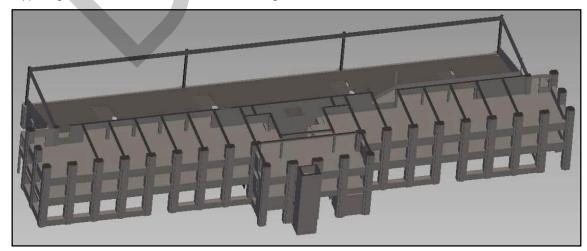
Cutaway showing beams, walls, and columns at the second floor level at GNS
